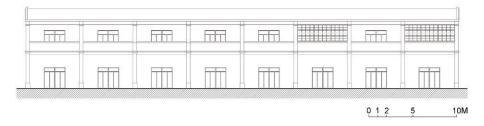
Elevation of No. 2 Arcade Building (Speculated) in the 1930s (Source: Drawn by the Author)
